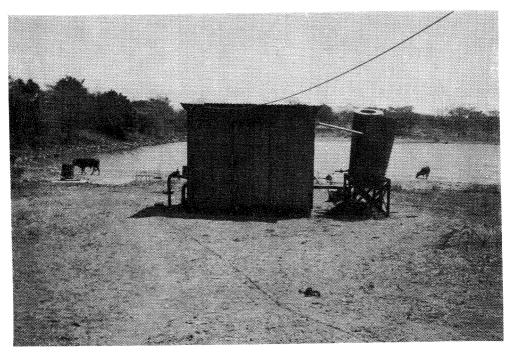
Lowland reservoir with pumped diversion. (Railway Dam at Zimba).
